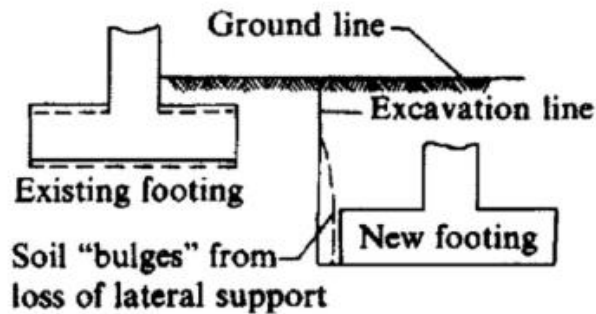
The Possible settlement for existing foundation due to the lack of suitable retaining wall
